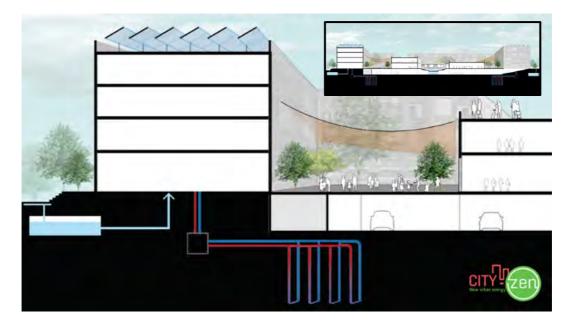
Detail of 'El Corte Nuevo', an infill plan with new retail and a sustainable energy system – *image by Roadshow Facilitators
